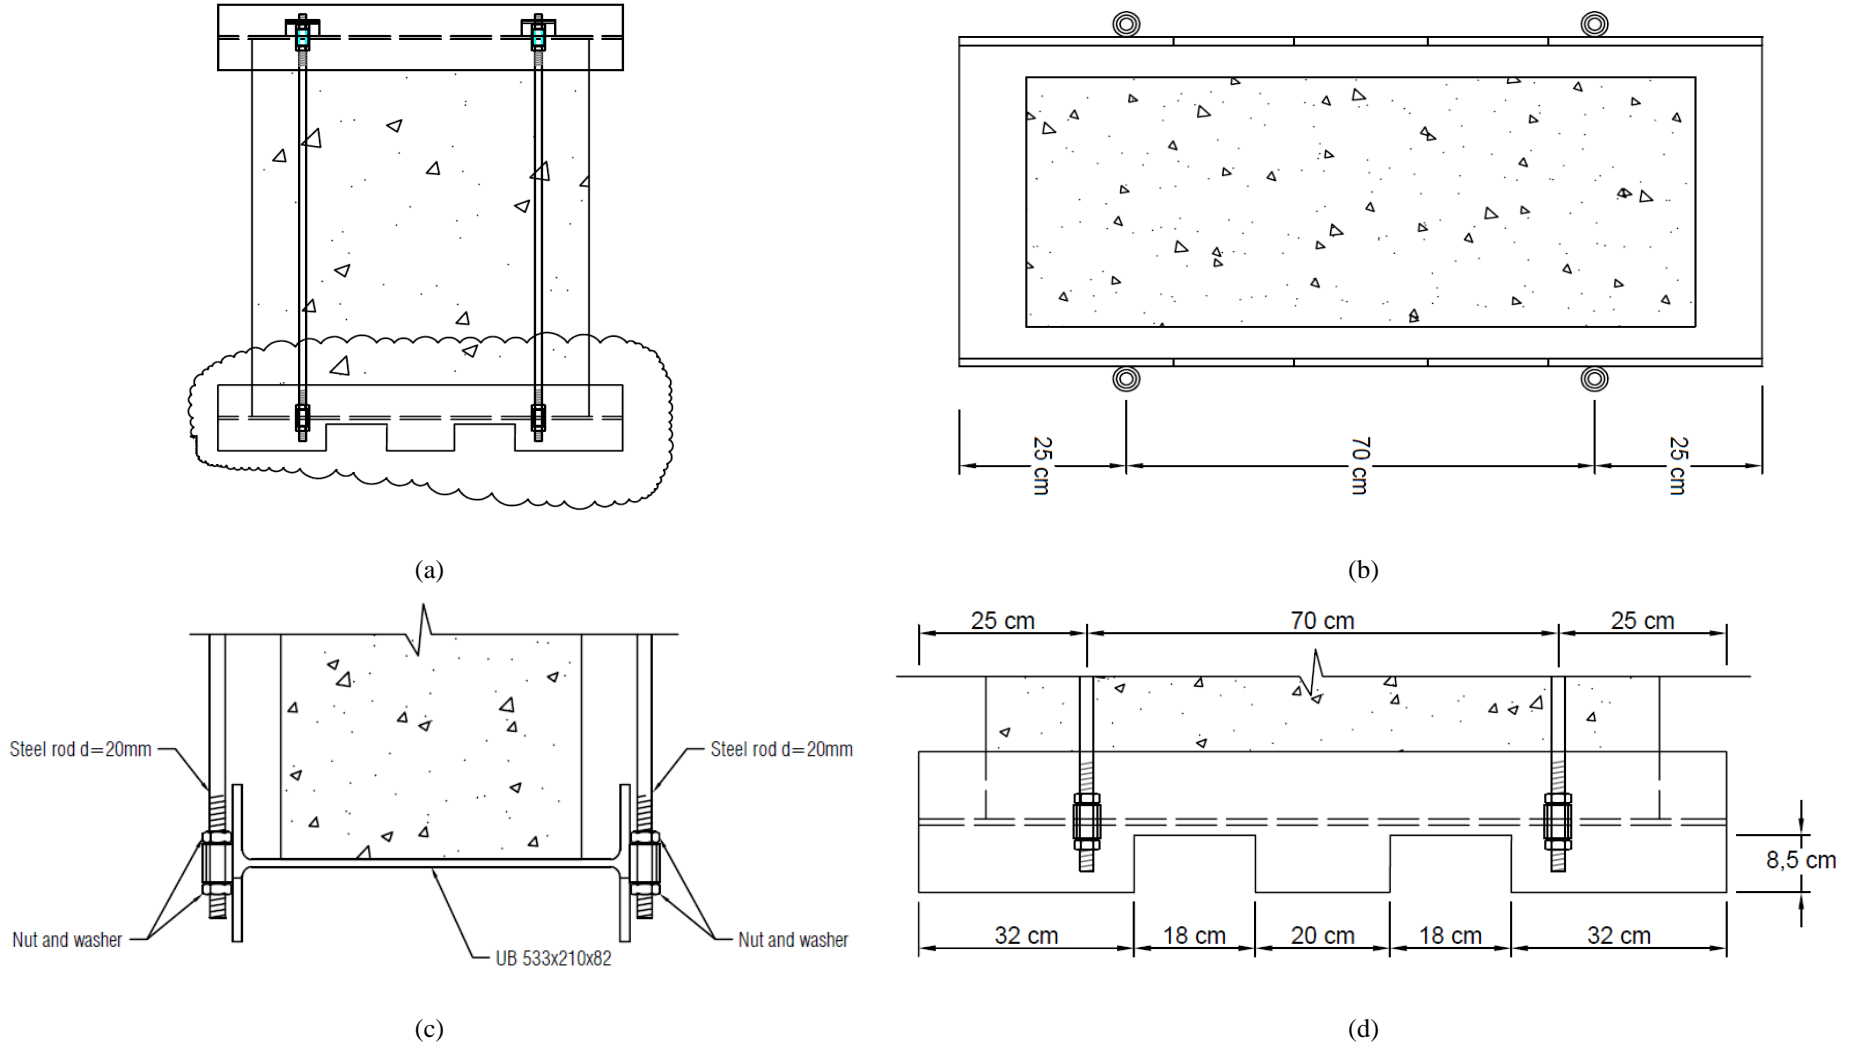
Bottom pallet (a) general sketch, (b) top view, (c) side view and (d) front view.
